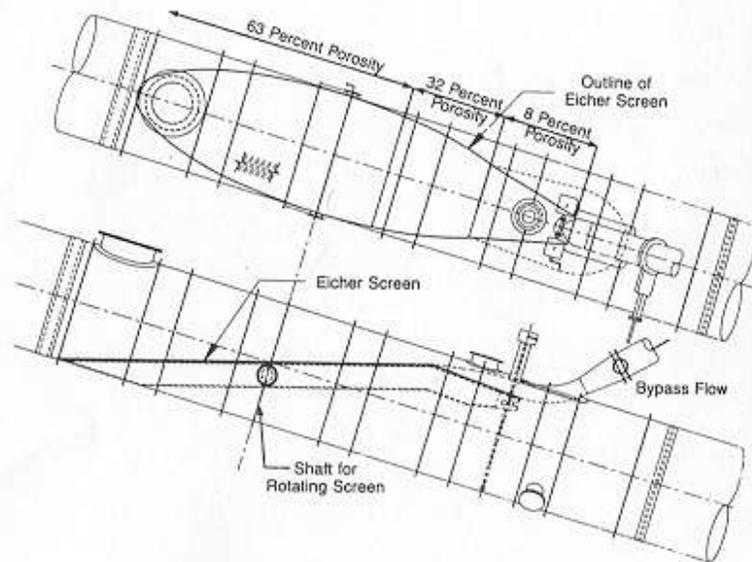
Plan and Section Views of the Elwha Eicher Screen (courtesy Harza Northwest and Hydro Review).
